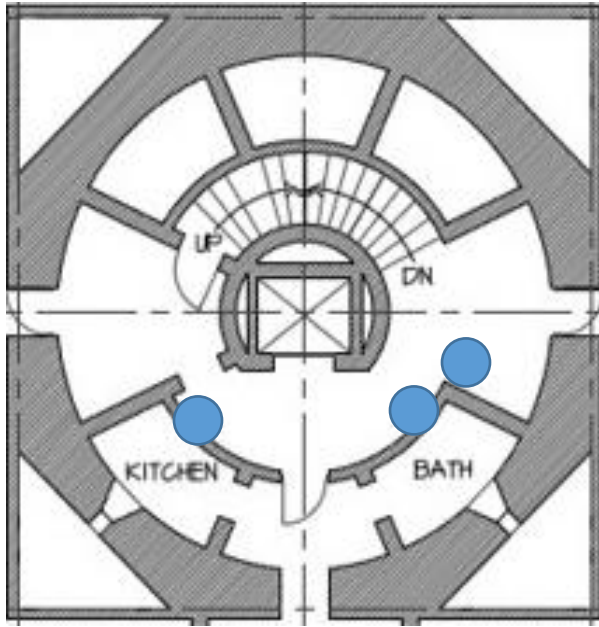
Blue dots shows florescence and other damages observed on the *Sports and Outdoor Life* murals located on the second floor.
